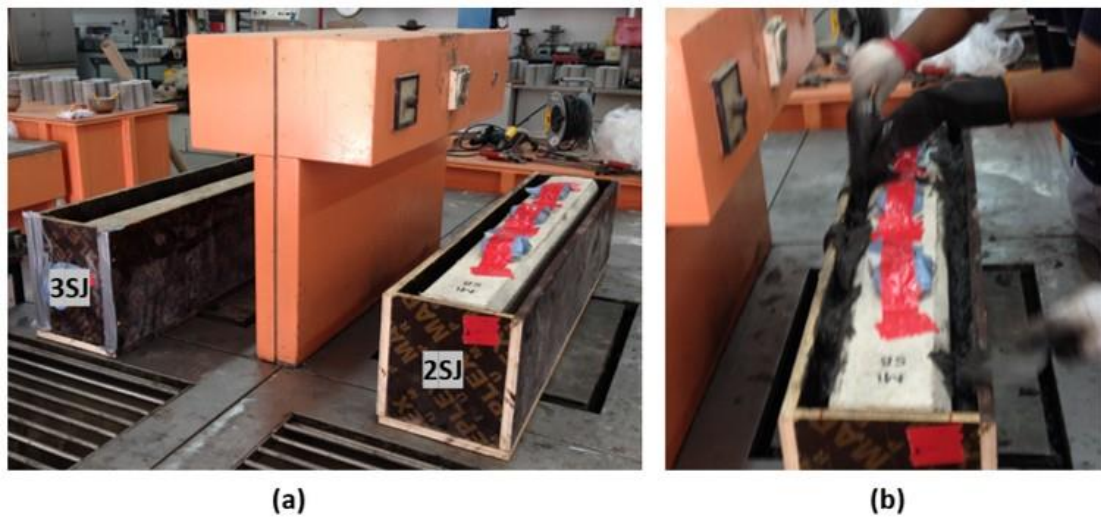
(a) Molds for 2SJ and 3SJ, (b) casing UHPC inside the beam mold
